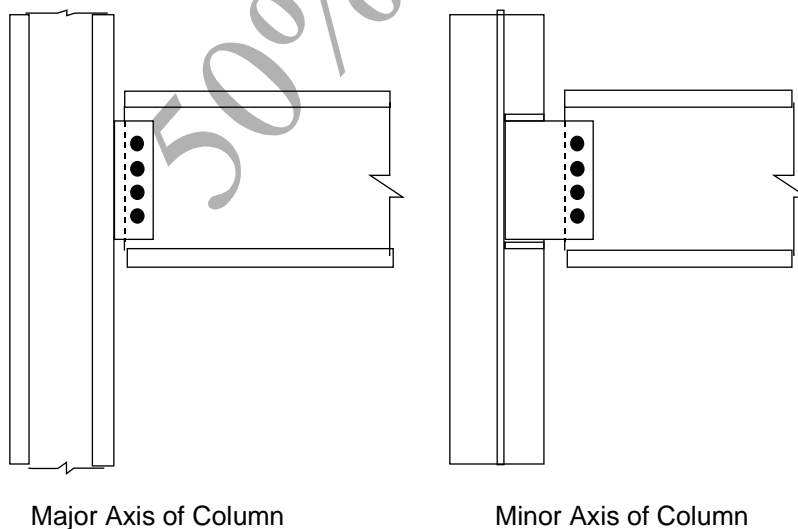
Typical Simple Shear Tab Connection without Slab
